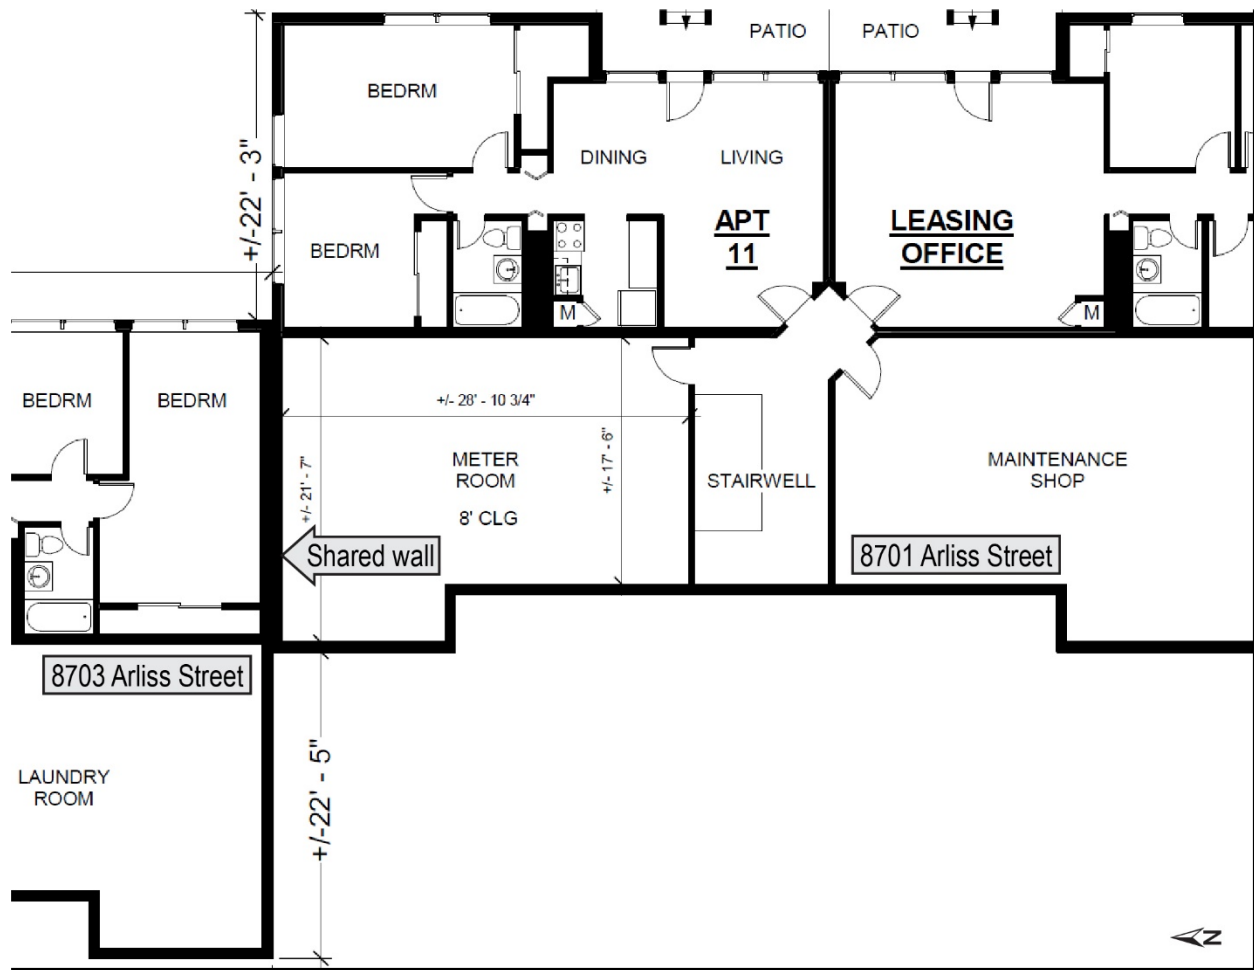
A plan for the basement/terrace floor for 8701 Arliss Street and the shared-wall portion of 8703 Arliss Street. (Graphic provided by Kay Management.)
